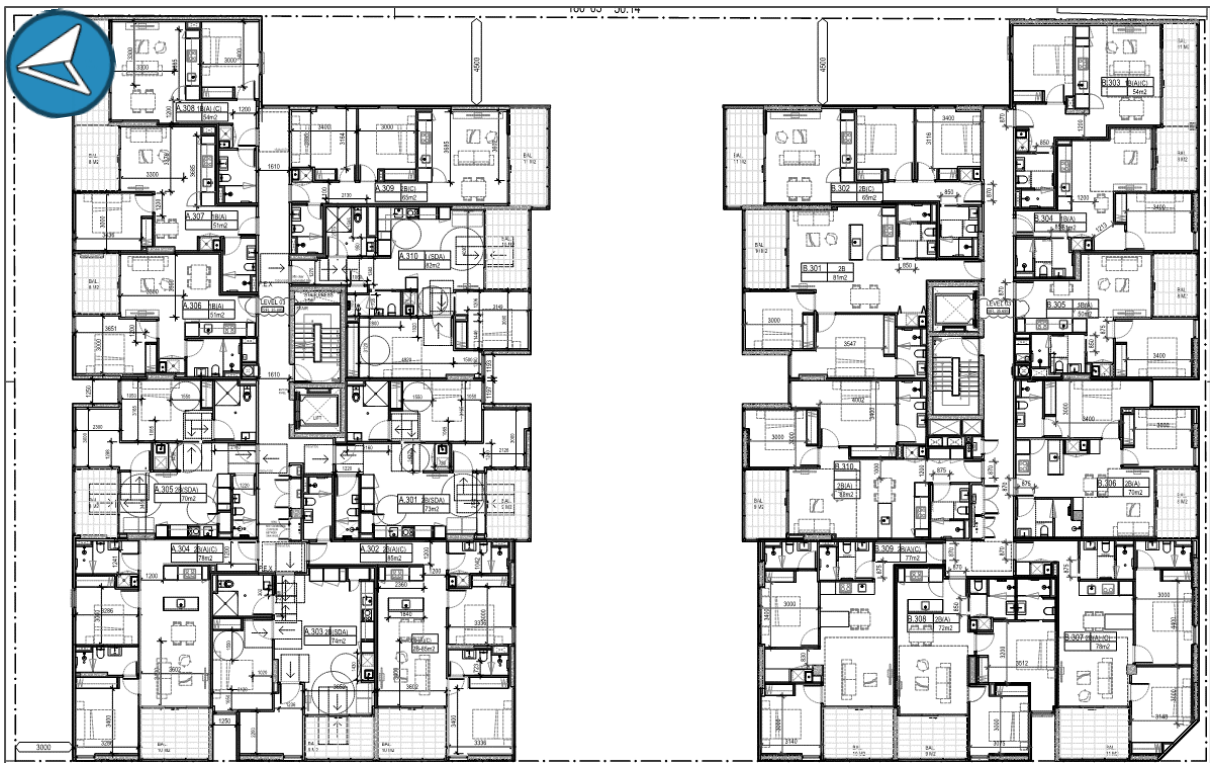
Proposed Floor Plans – Level 3 (Image Source: Artisan Architects)
